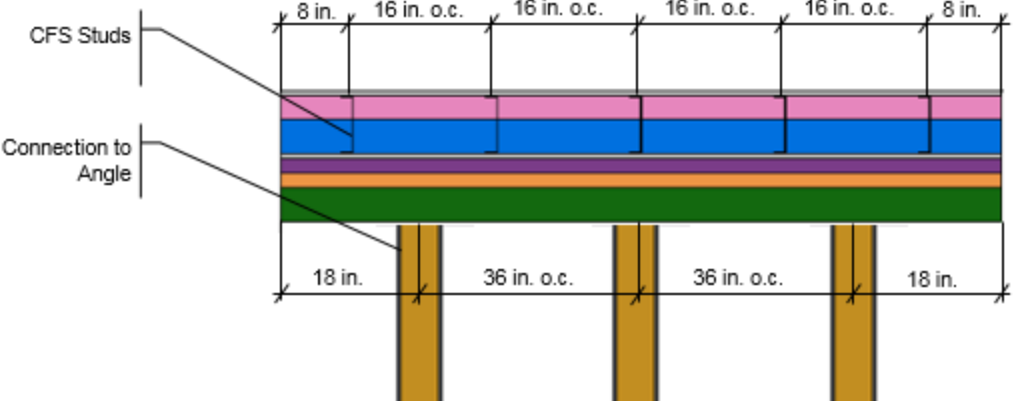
Plan view of wall cavity (depicted for canopy beam, but as shelf angle spacing is 36" on center, geometries are applicable for both cladding details)
